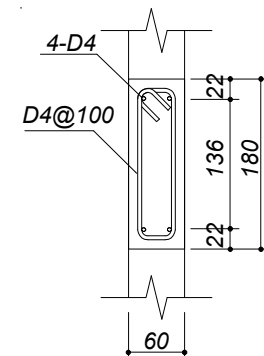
Configuration and bar arrangement of specimens (unit: mm)
